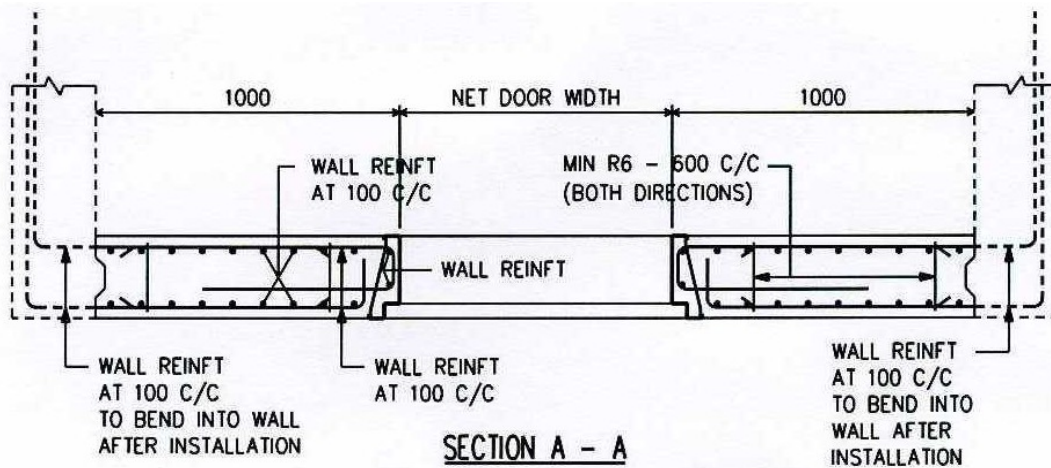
(k) DETAILS OF PRECAST SS DOOR FRAME PANEL (TYPE 1)
